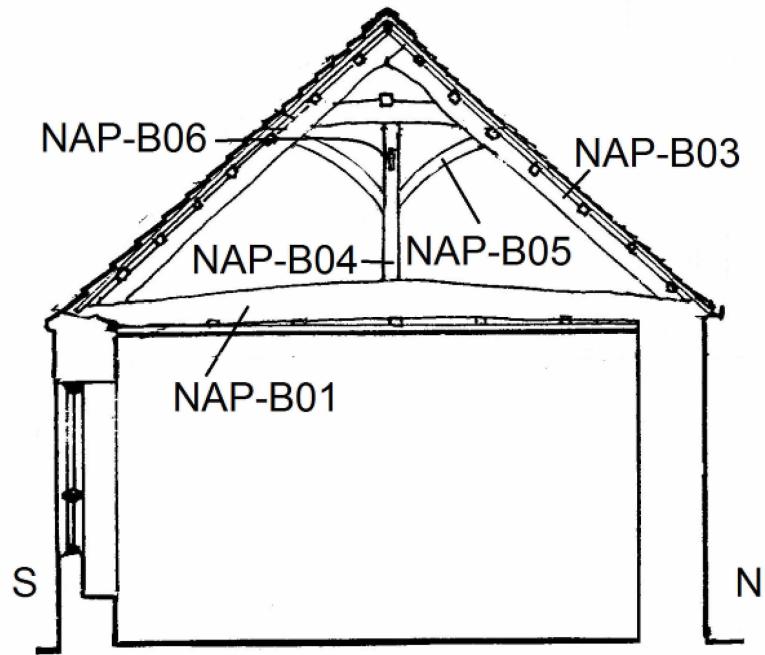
Hall, truss 2, showing the location of samples NAP-B01, NAP-B03–6 (John Warren)
